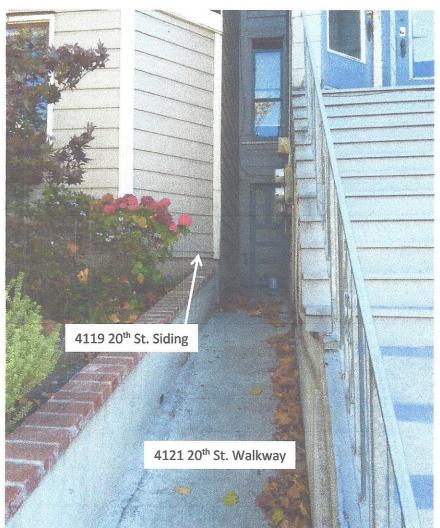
Shows 4119 20th St. Sidings and 4121 20th walkway
